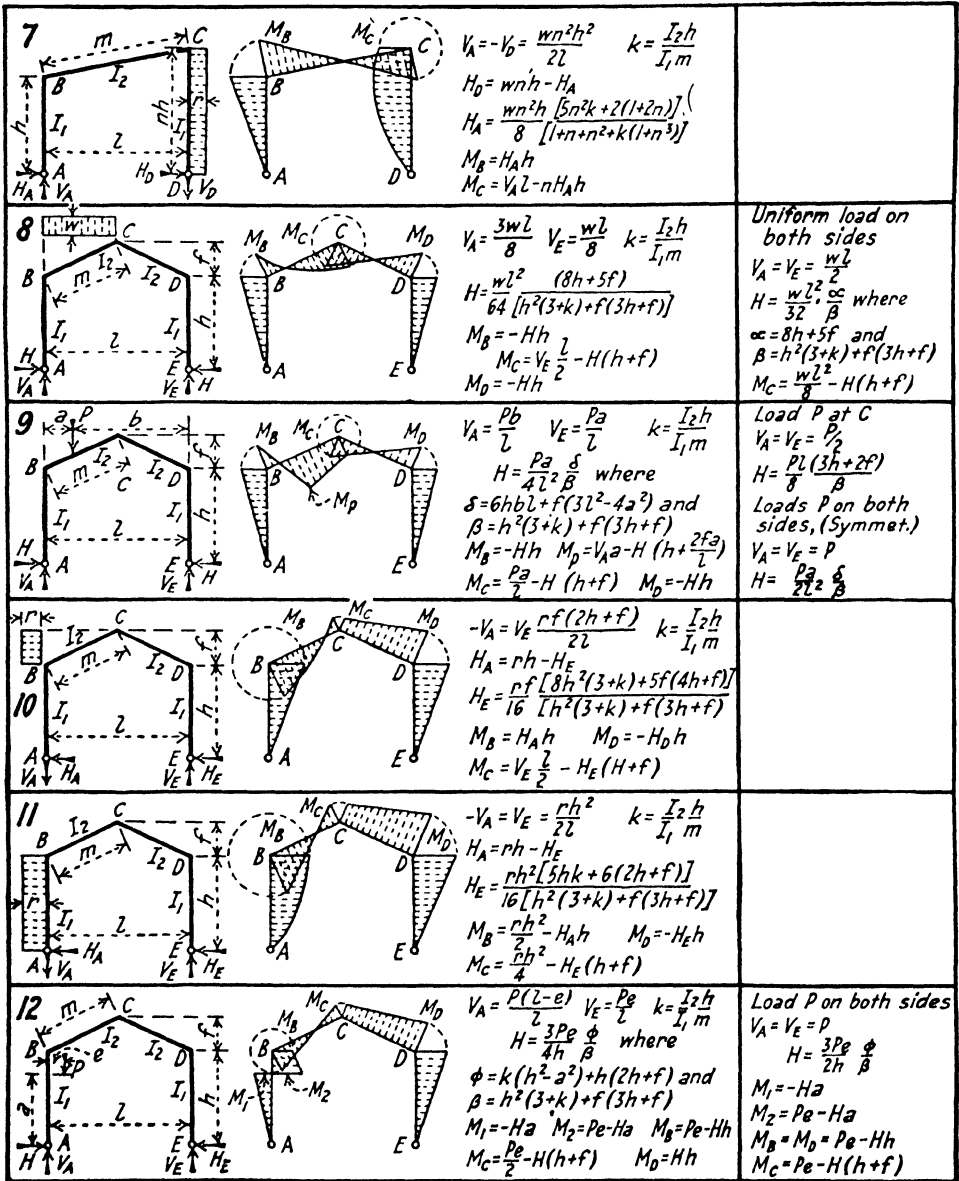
STRESSES IN STIFF BUILDING FRAMES.
